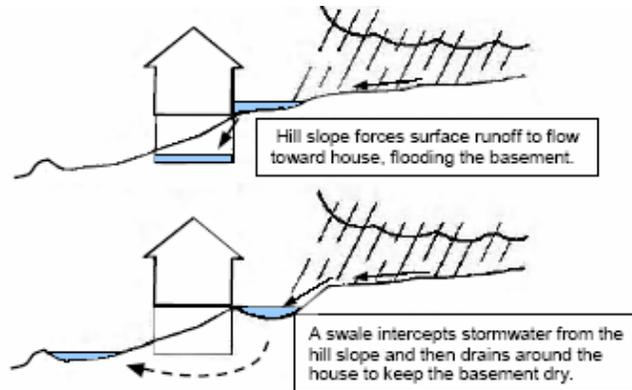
Correction of typical slope drainage problem using swale or ditch.
